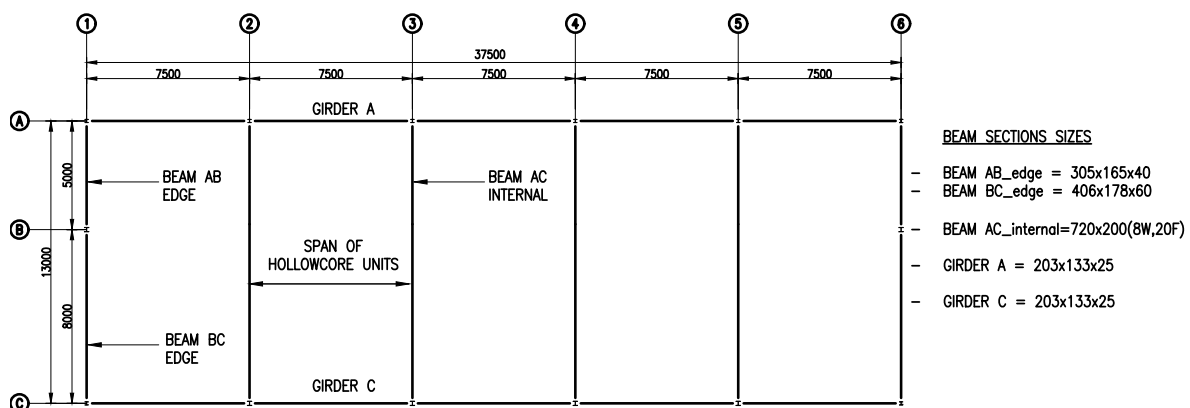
Long span floor layout in steel building supporting hollowcore units
